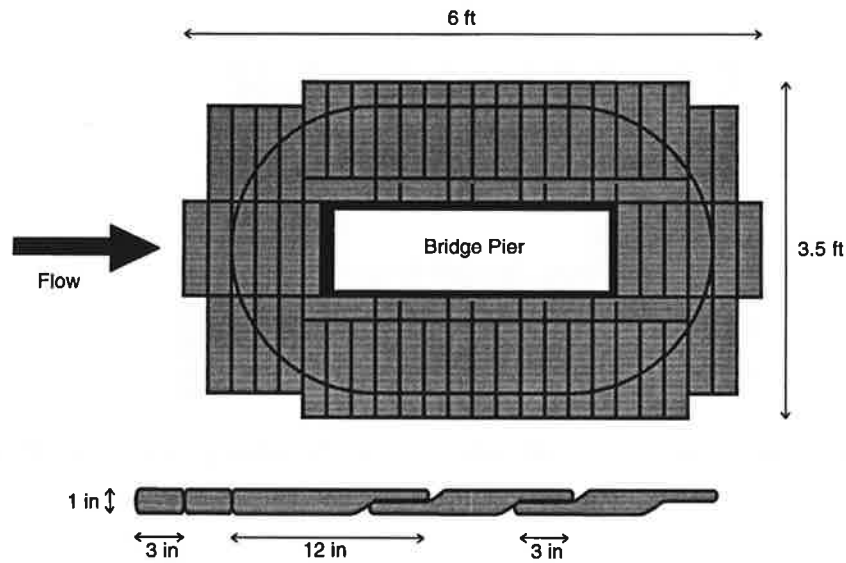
Placement of grout filled bags around the rectangular pier for series MC-GB2.
